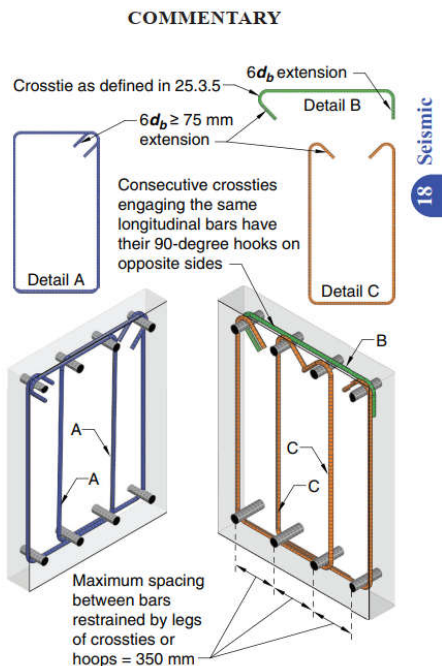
Examples of overlapping hoops and illustration of limit on maximum horizontal spacing of supported longitudinal bars.
